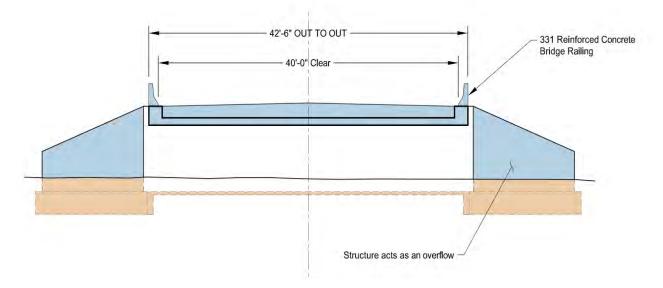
EI.24.11- 3: Roadway view of a multi-cell reinforced concrete culvert.
